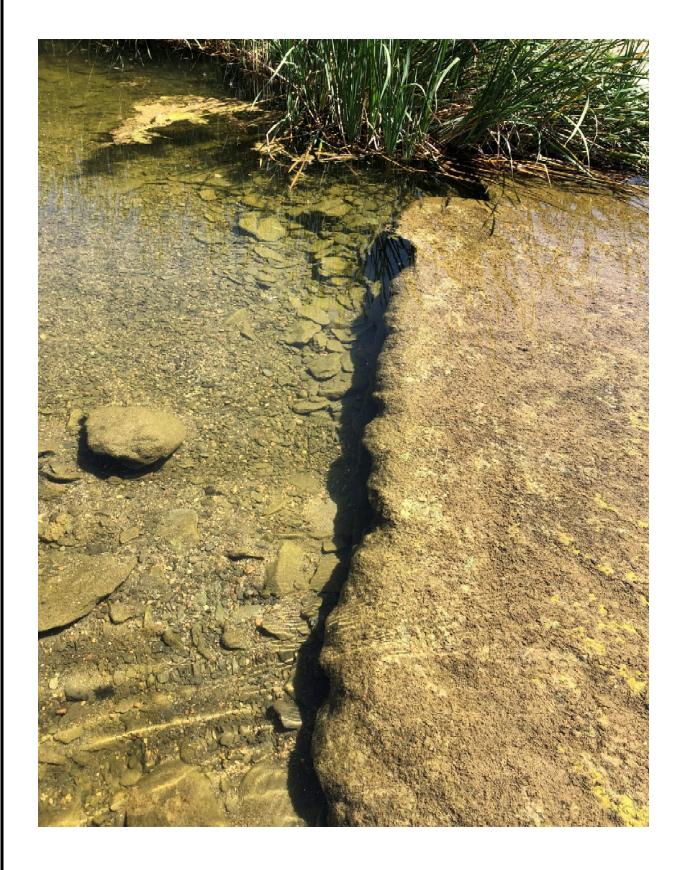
EROSION AND UNDERCUTTING AT HEADWALL/CREST - LOOKING EAST
